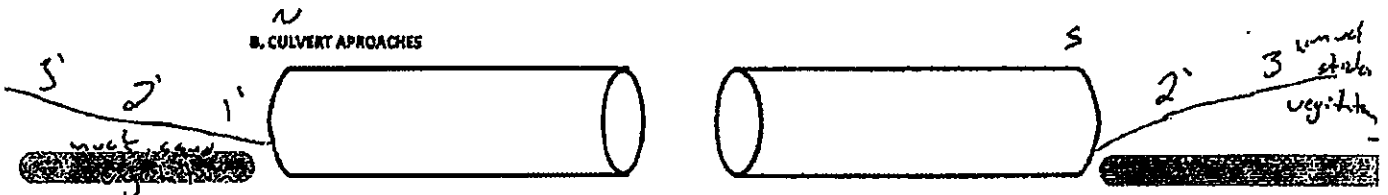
DETAIL THE GENERAL CONDITION OF THE PIPE(S) pipe is in good condition. North pipe has section cut out.
